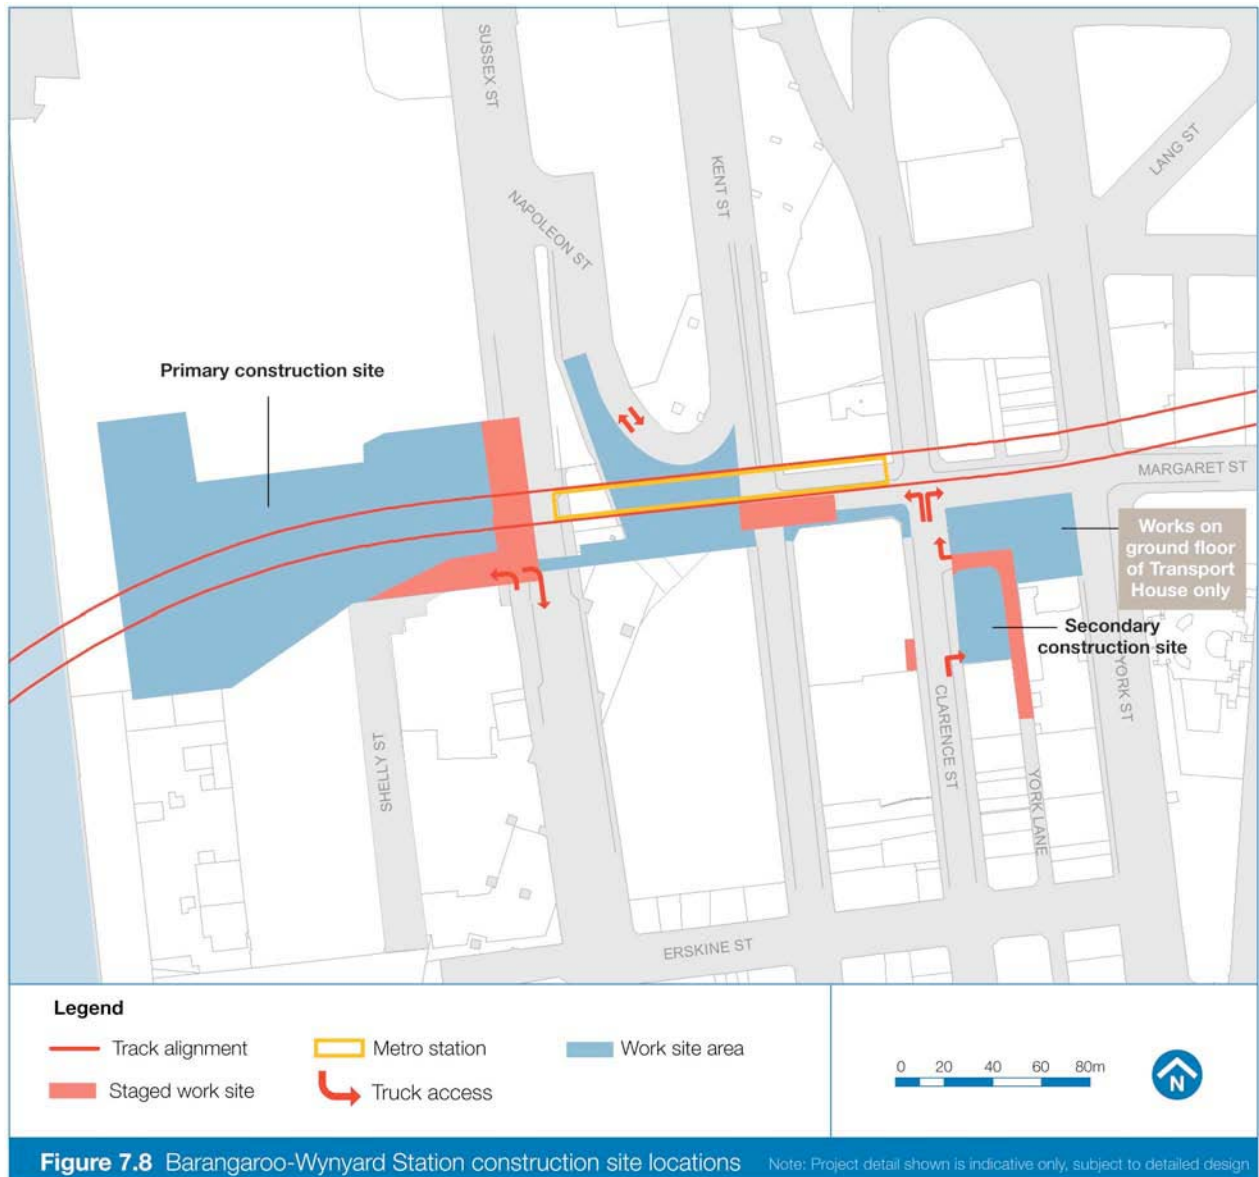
Barangaroo-Wynyard Station construction site locations Note: Project detail shown is indicative only, subject to detailed design
